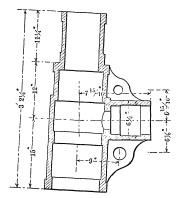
Section of Column Joint in Plane through Center of Tower.
